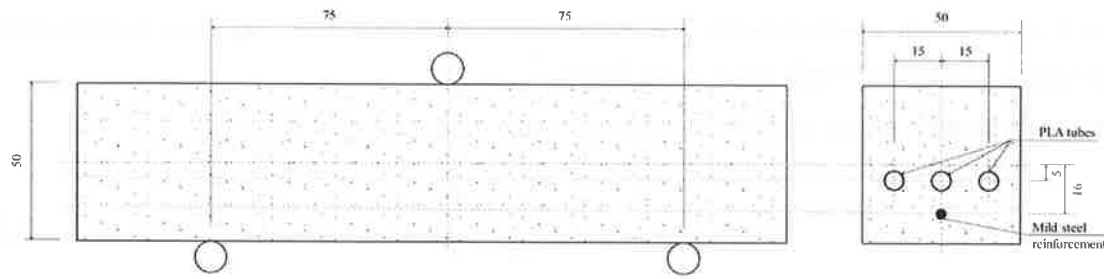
Specimen side and end views for three-point bend testing. All dimensions in mm.
